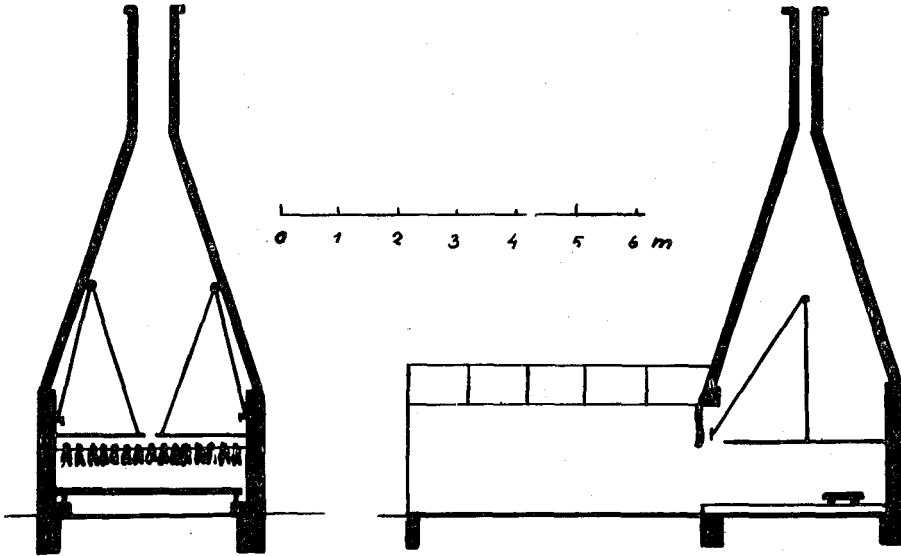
Hot-smoking kiln of the type in use for herring on Bornholm, Denmark. The fire is placed on a flat trolley which is mounted on wheels. (Fiskeriministeriets Forsøgslaboratorium, Copenhagen, Denmark).
